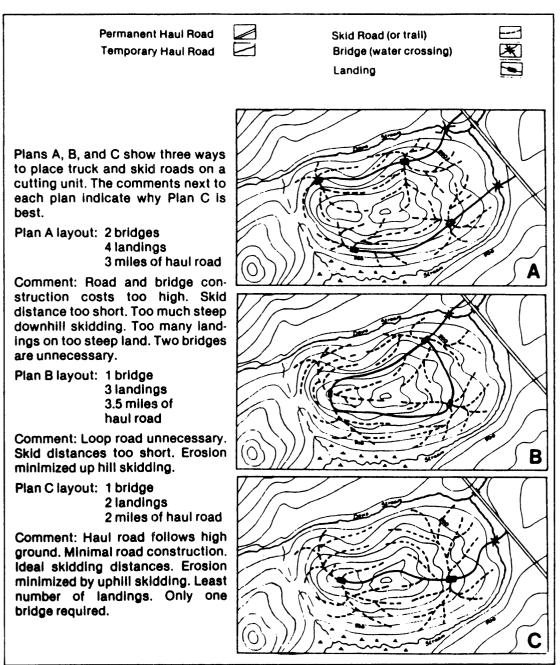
How to select the best road layout (Hynson et al., 1982).
